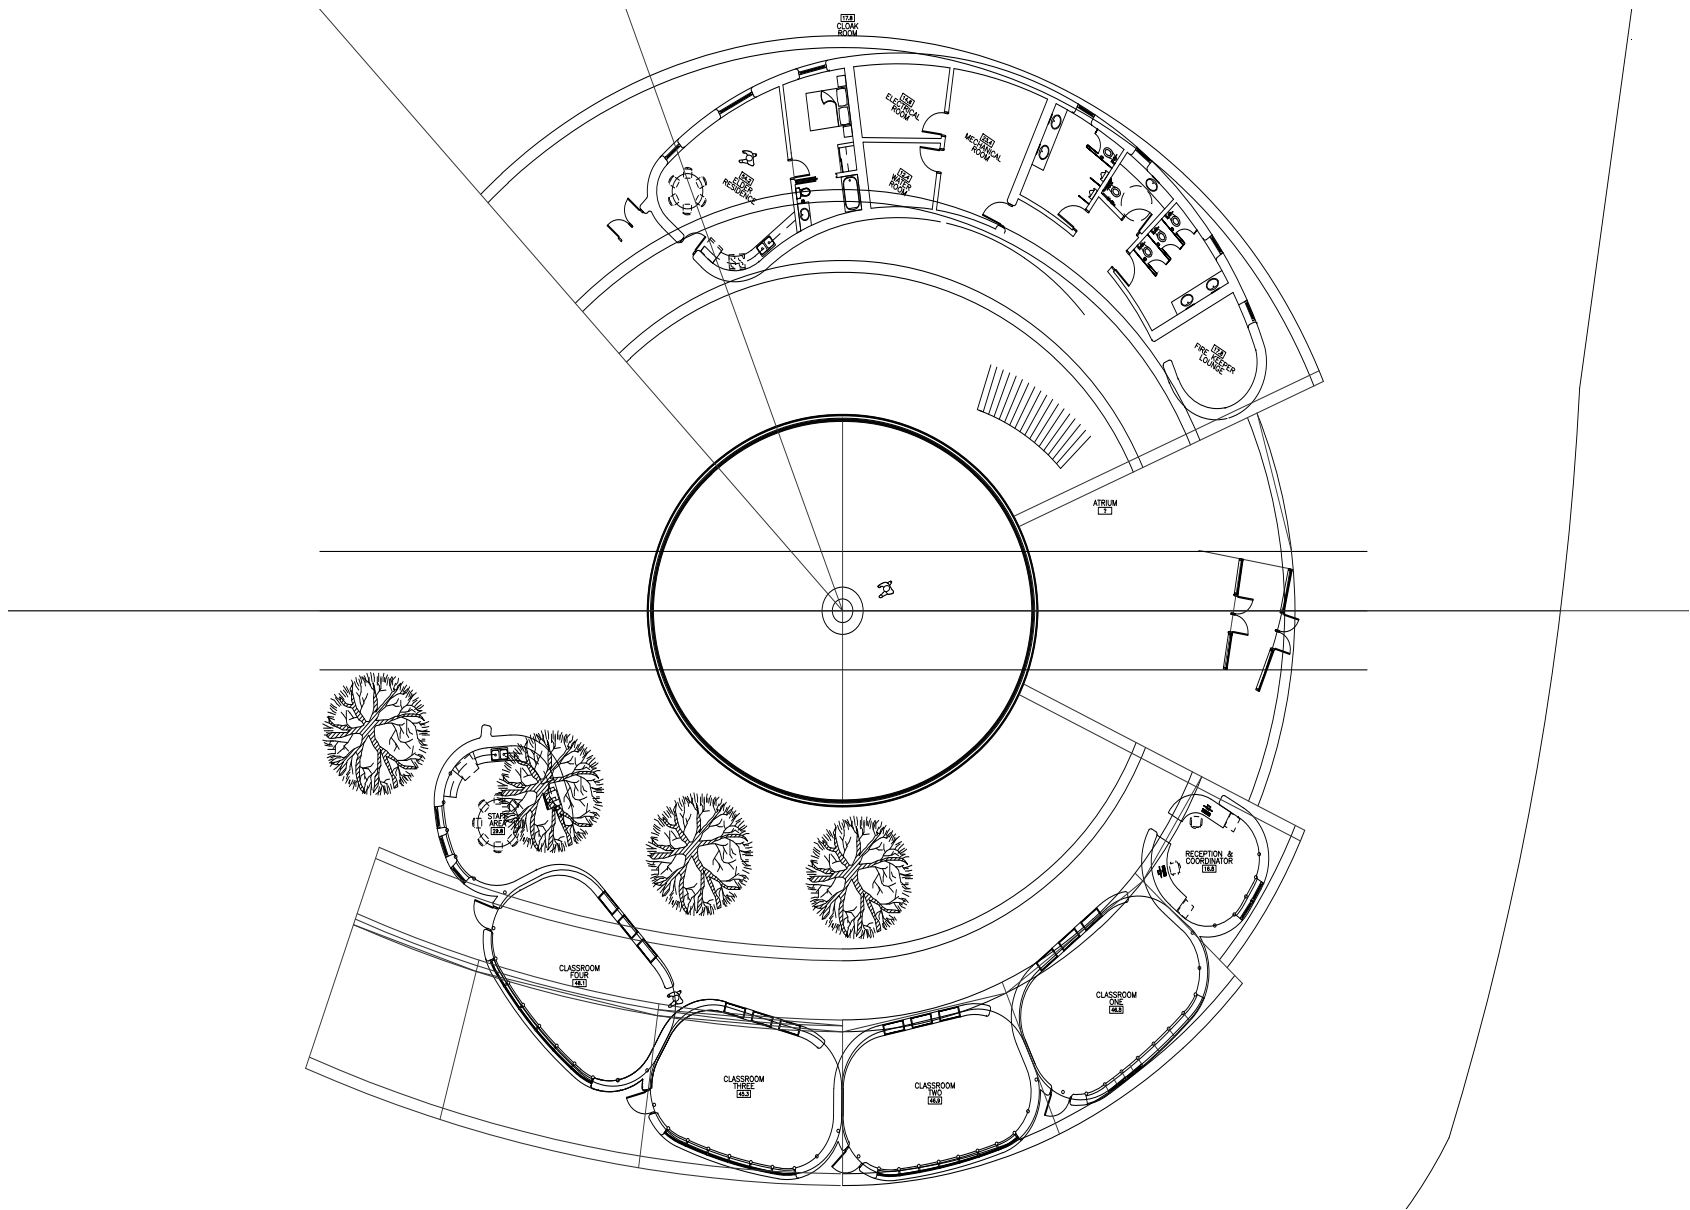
Transition between sixth and seventh iteration: playing with the arc/courtyard space between main building and gathering space
